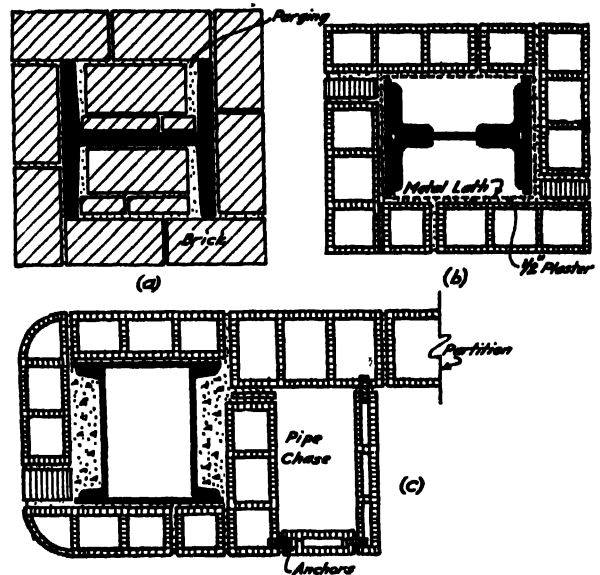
BRICK AND TILE ENCASED STEEL COLUMNS
